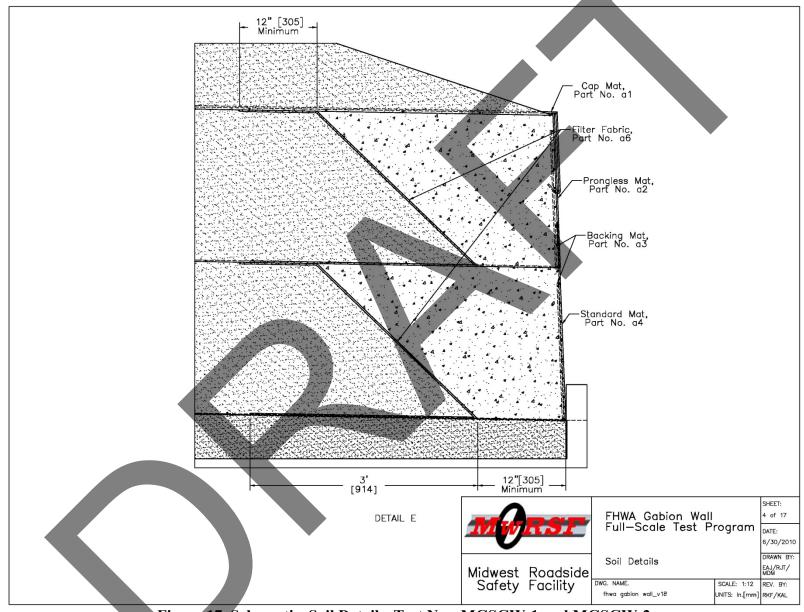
Schematic. Soil Details, Test Nos. MGSGW-1 and MGSGW-2.
